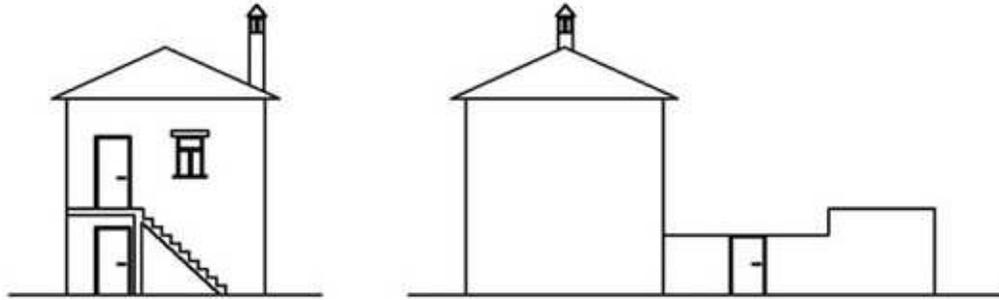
House type 2: Front side elevation (left) and left side elevation (right) (Drawings by author)
